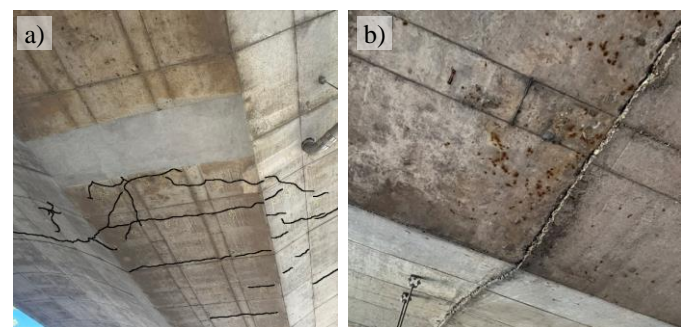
Visible damages: a) cracks with extensive widths, b) rust staining and displacement within coupling joint
